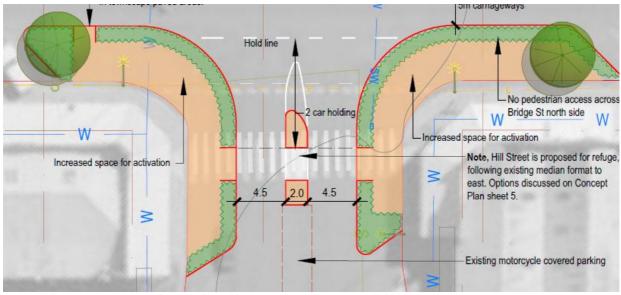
Hill Street Intersection, showing planted barrier protected spaces available for activation.
